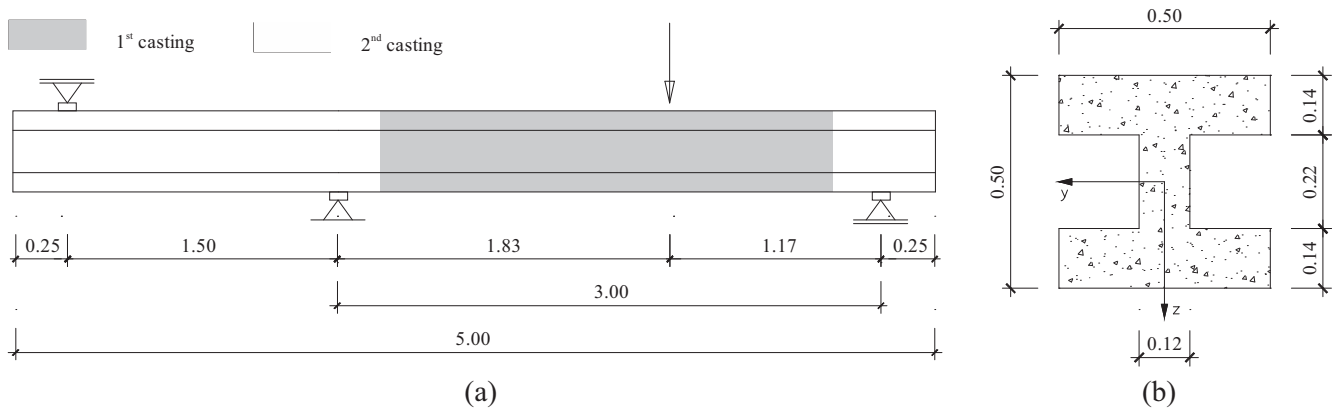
Beam specimen: (a) side view; (b) cross section.
